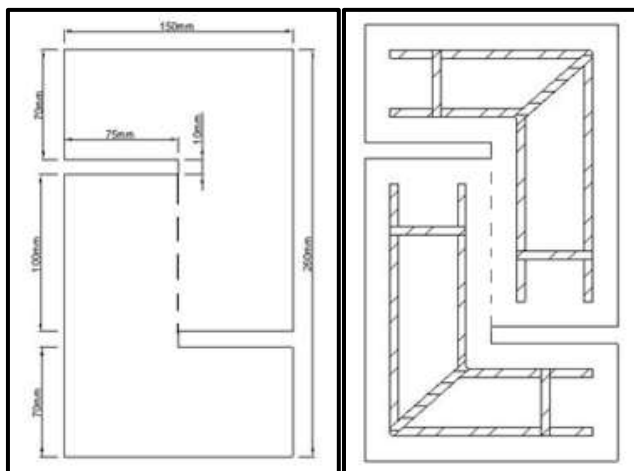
Push-off test specimen Fig 2: Reinforcement Arrangement in push-off specimen
